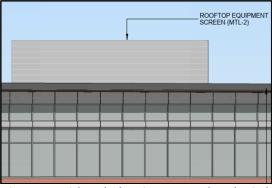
Partial north elevation; proposed mechanical equipment screening and curved glass façade
